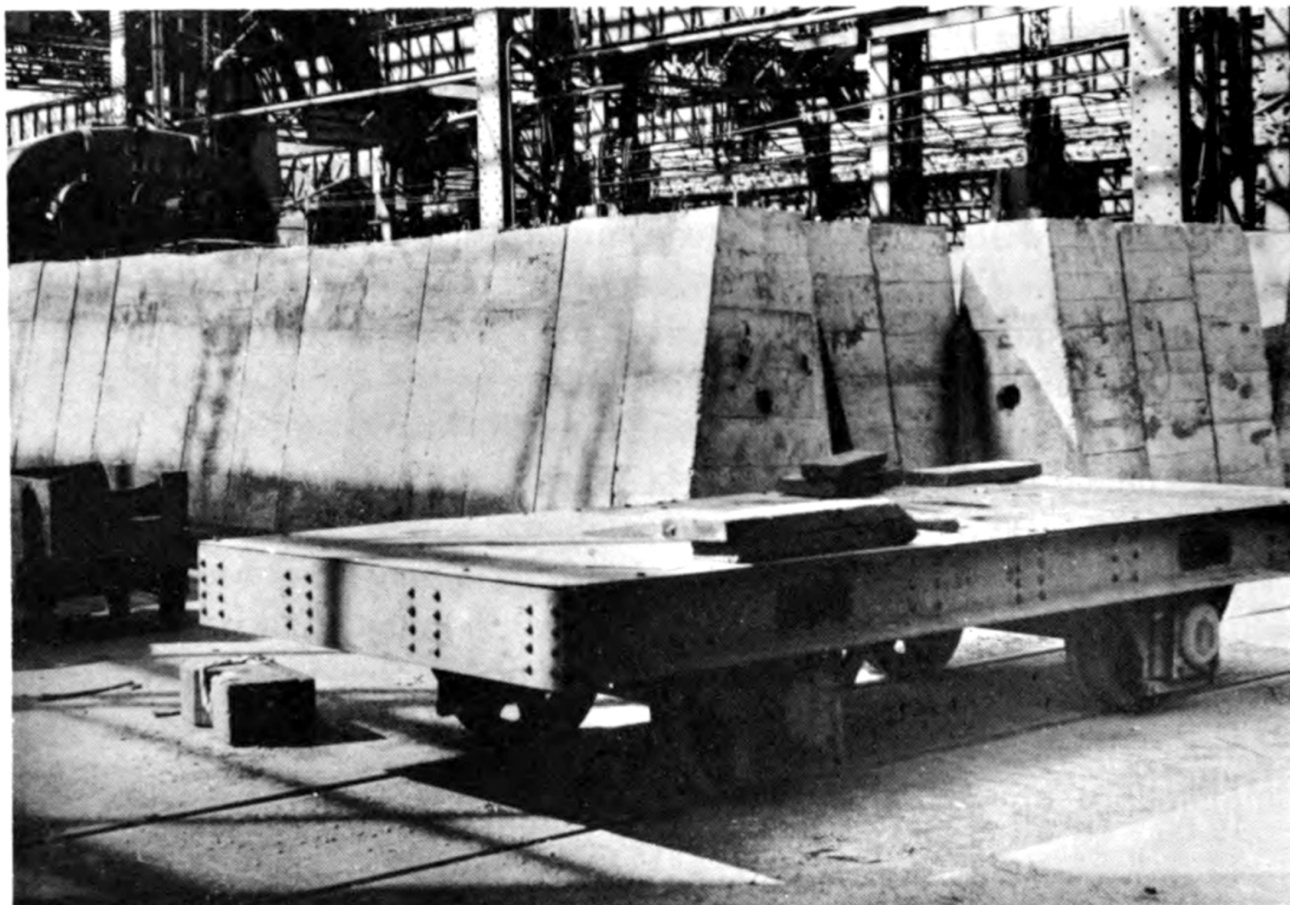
Precast, reinforced-concrete blast walls (0.85 mile from ground zero at Nagasaki).
